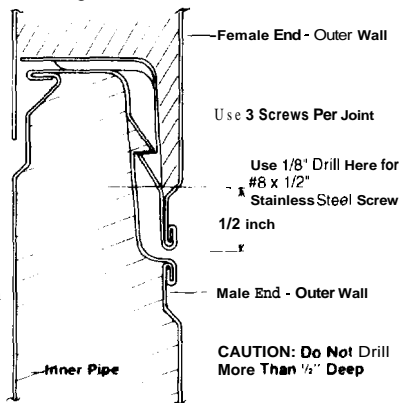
DRILLING DIAGRAM (Close up, Cross-section of Chimney Joint)
